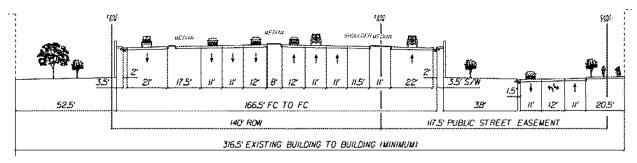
Existing Route 1 – Between 15th Street S and 12th Street S Cross Section (looking north)
